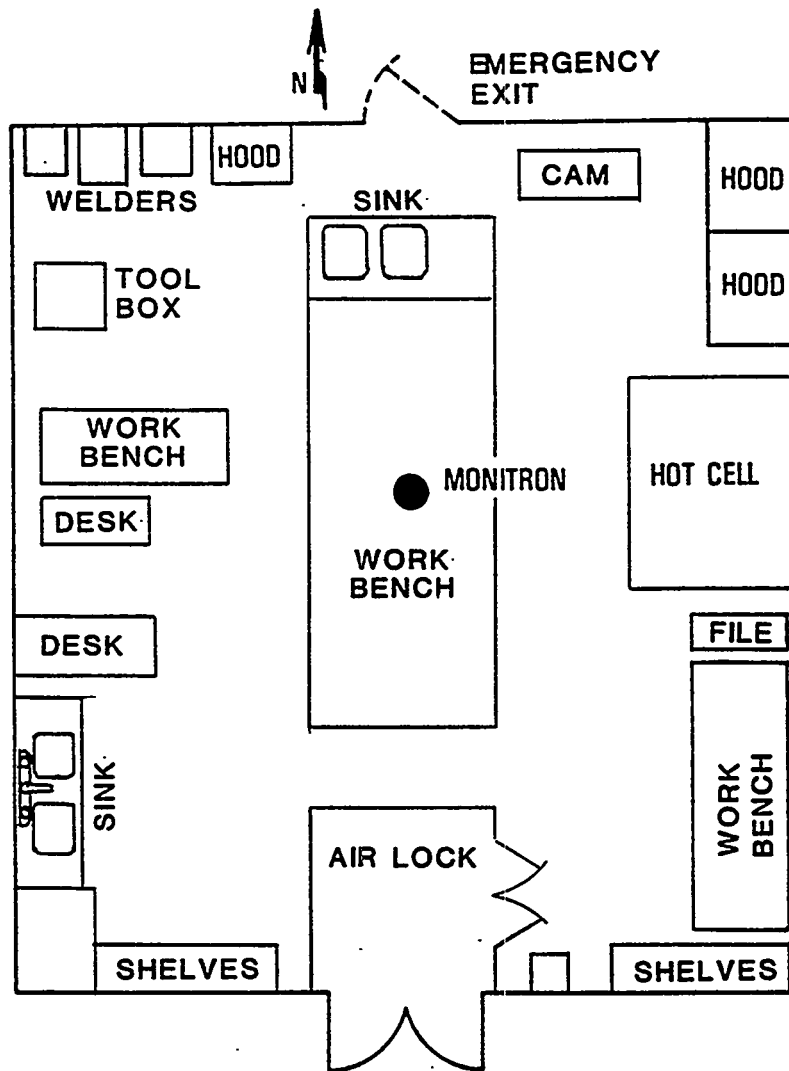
Floor plan of Building 3030—Radioisotope Development Facility.
